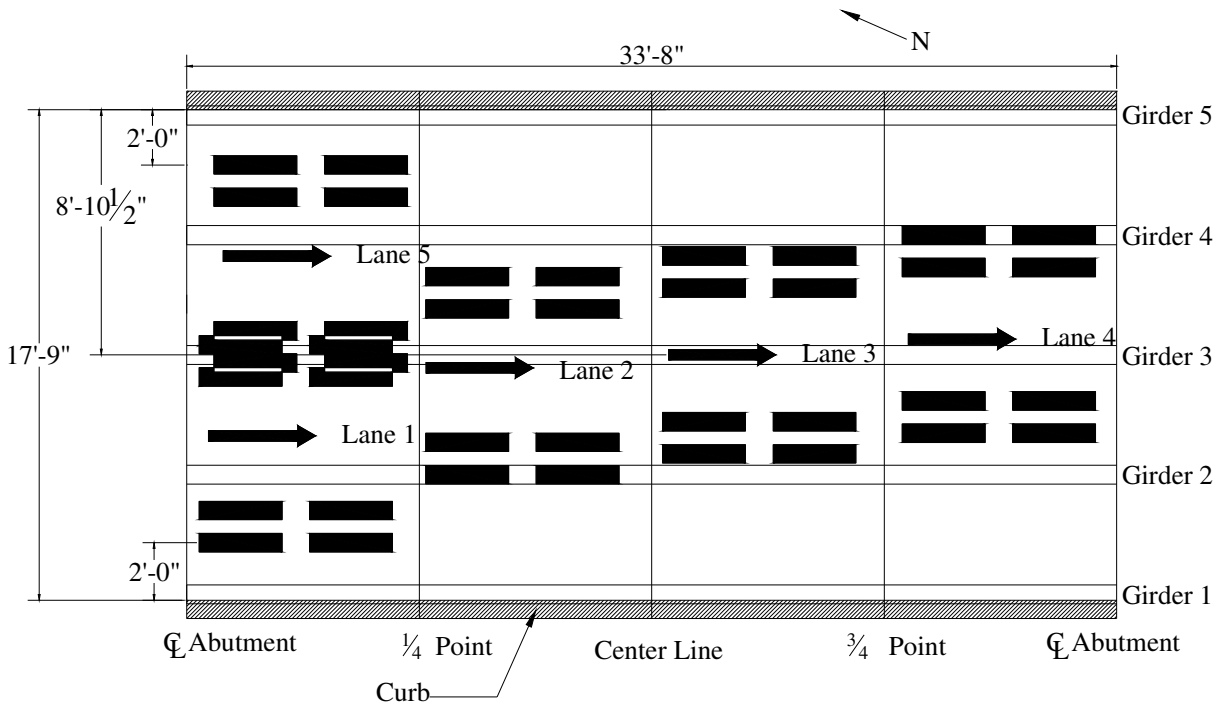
Plan View of Loading Lanes Used in KCB2 Test.
